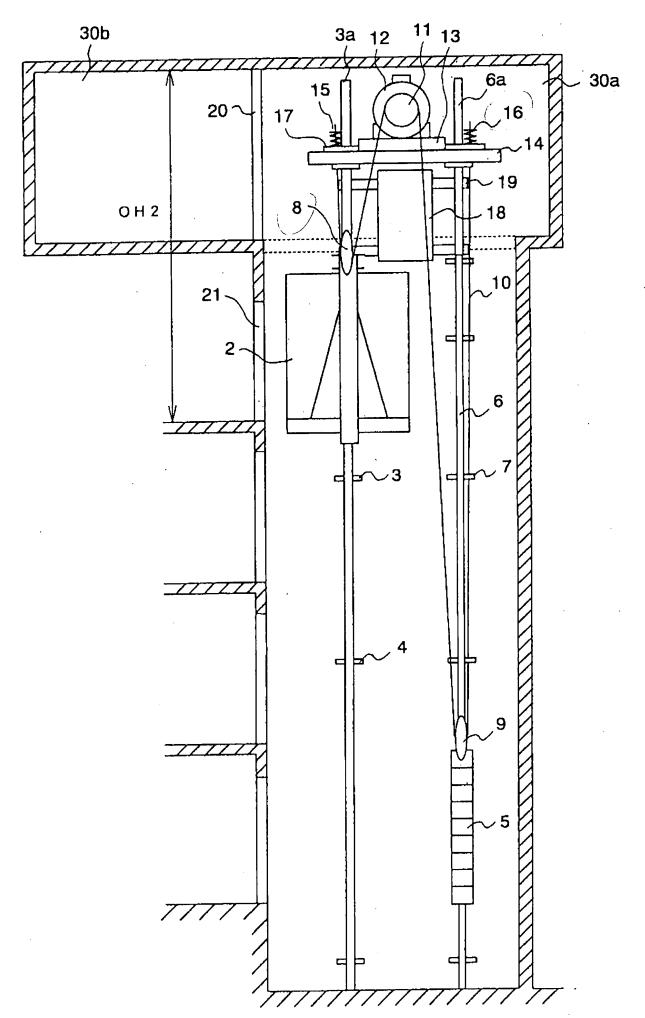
It is the whole elevator outline figure showing the conventional technology.
